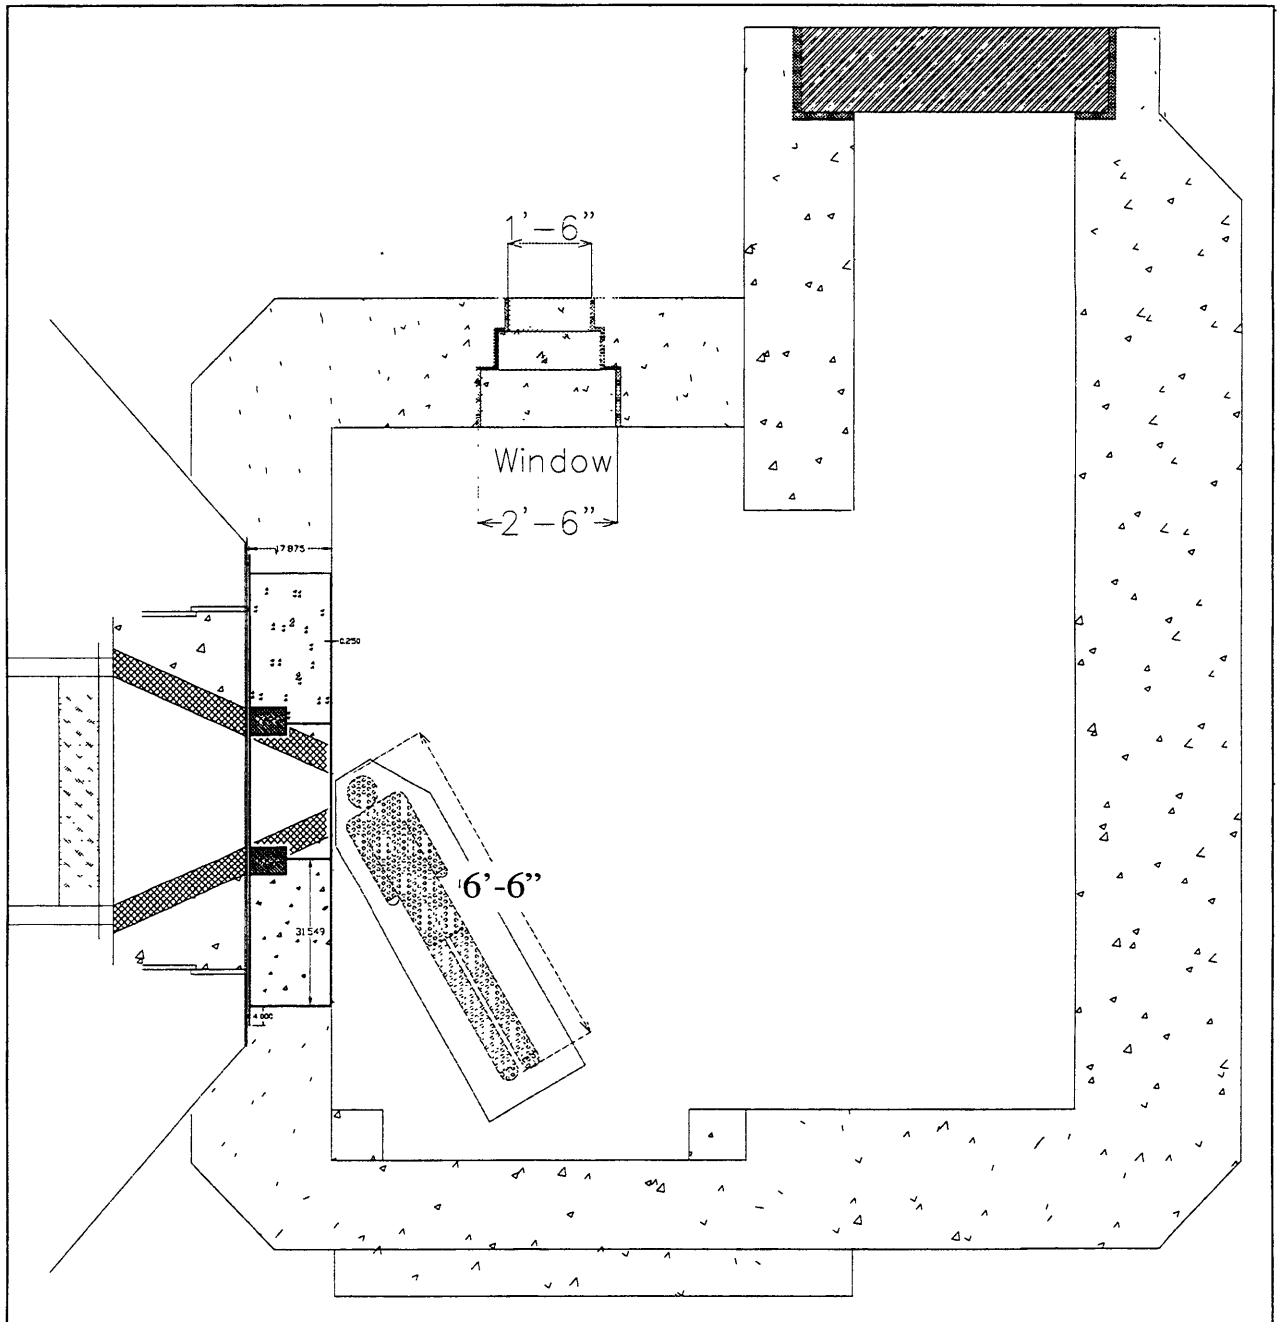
Medical room with window located 2.5 feet from beam opening. Top view.
